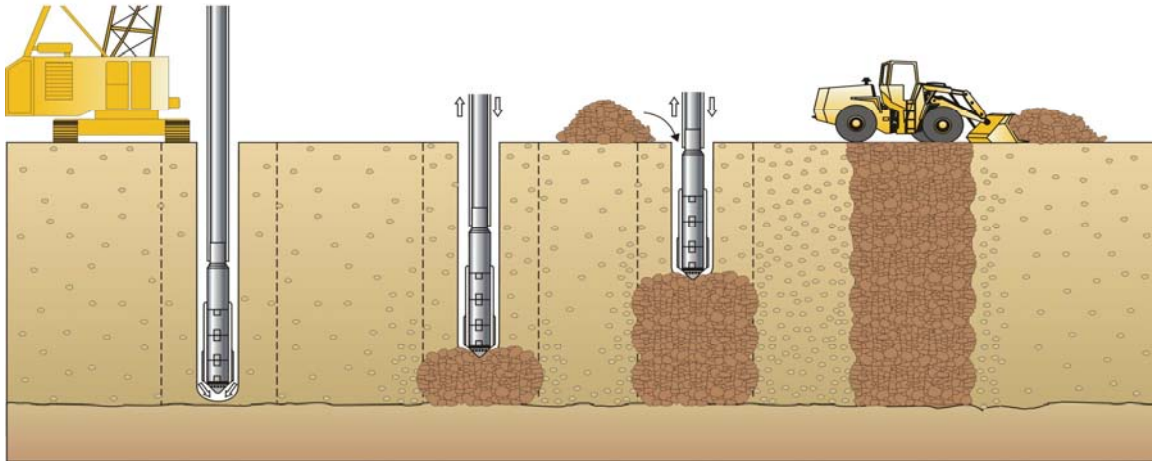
Construction Stages of Stone Column (Hayward Baker;
